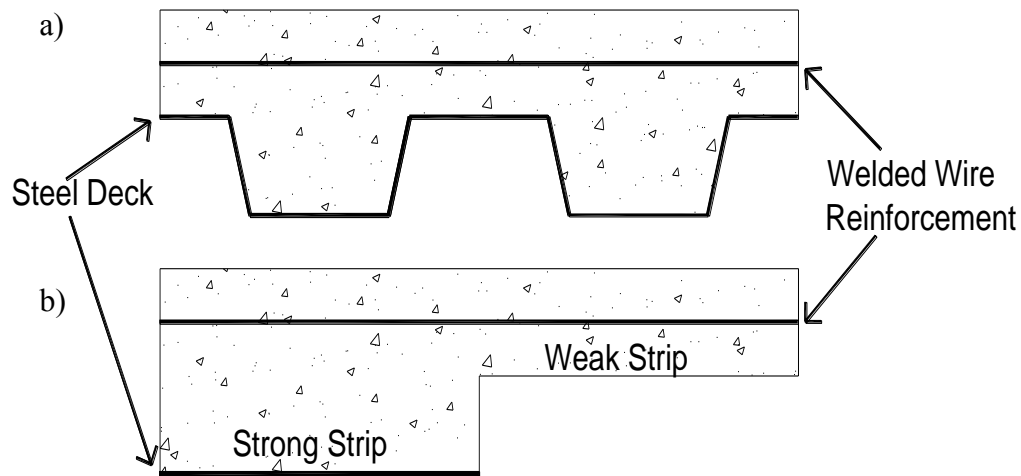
Simplified modeling of composite floor slab: (a) actual floor section; (b) simplified floor section
